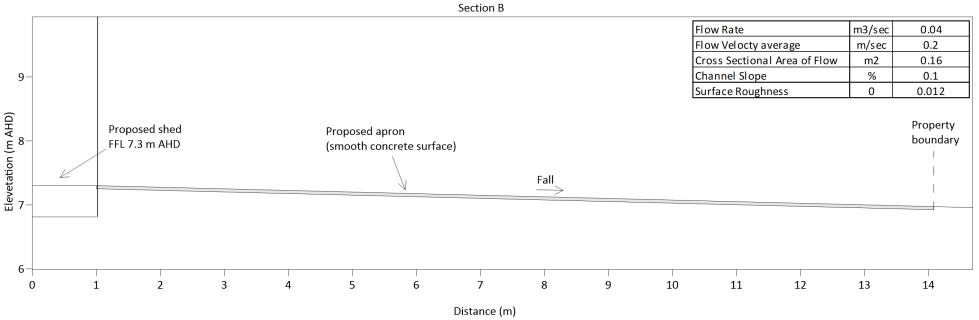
AEP Site Stormwater Flow Analysis - Cross Section B within the Building Envelope - Drawings Are to Scale and For Conceptual Modelling Purposes Only
